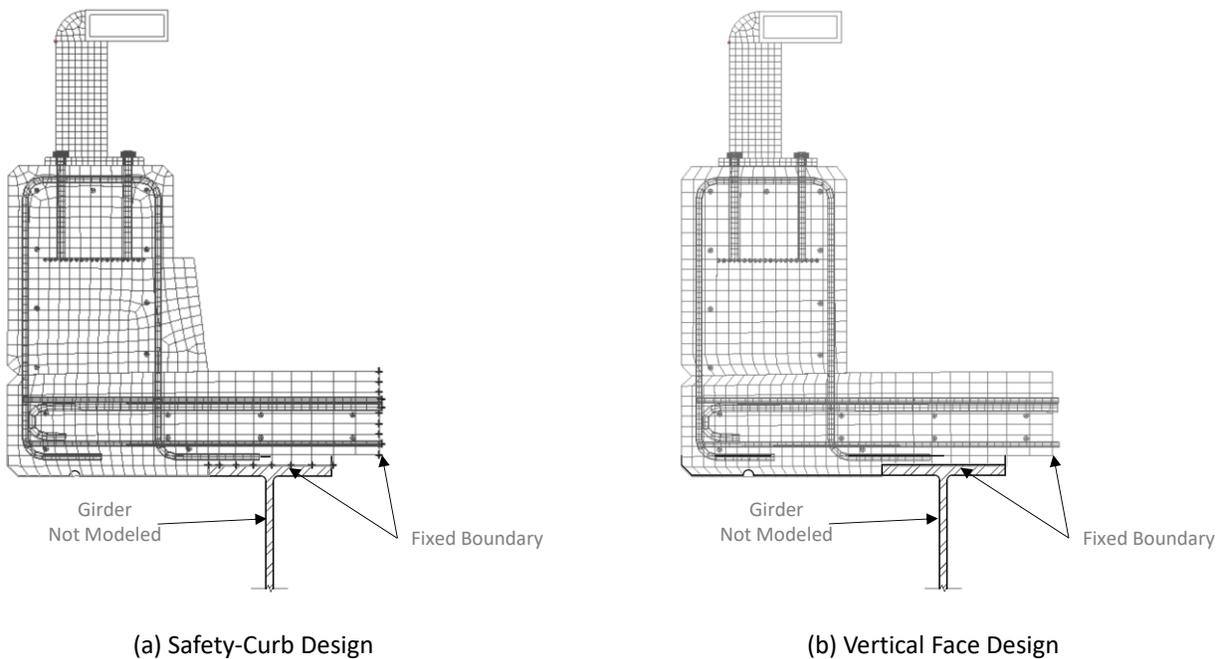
Transparent view of concrete showing model of base plate and anchor bolts.
